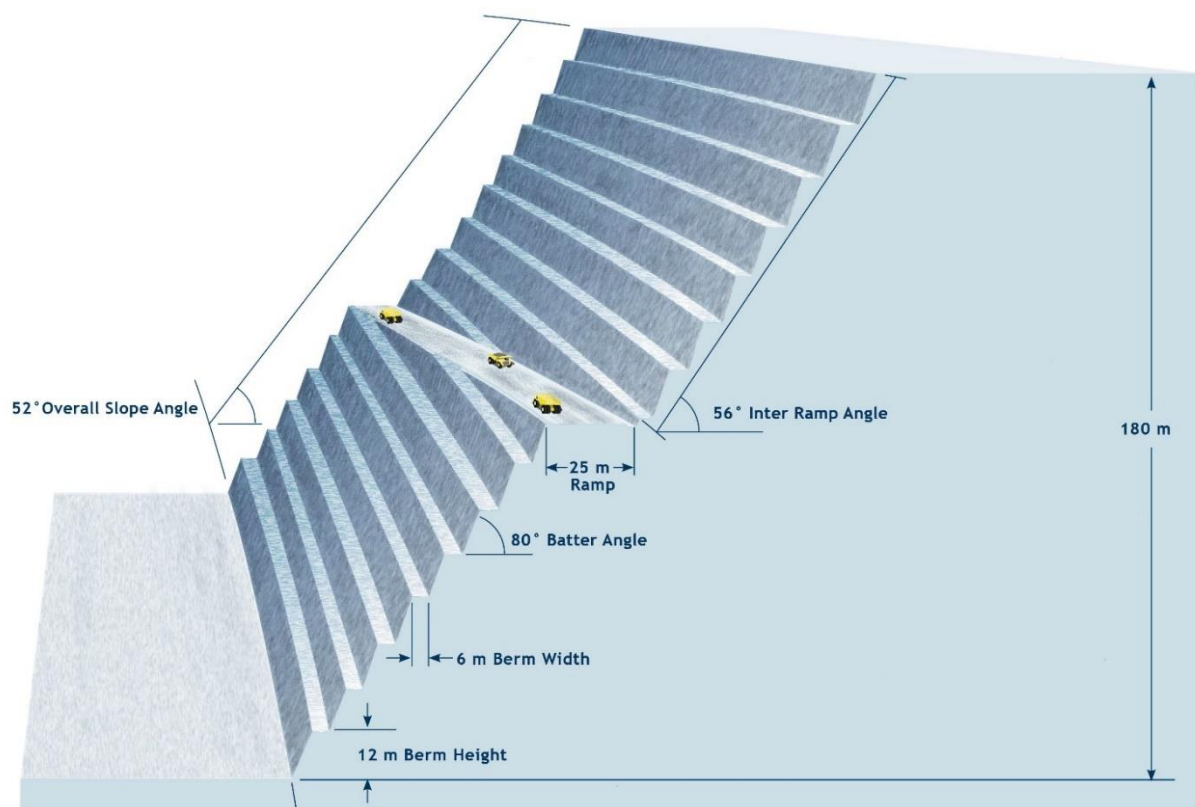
Representation of the Piedmont pit wall design based on wall design configuration assumptions
